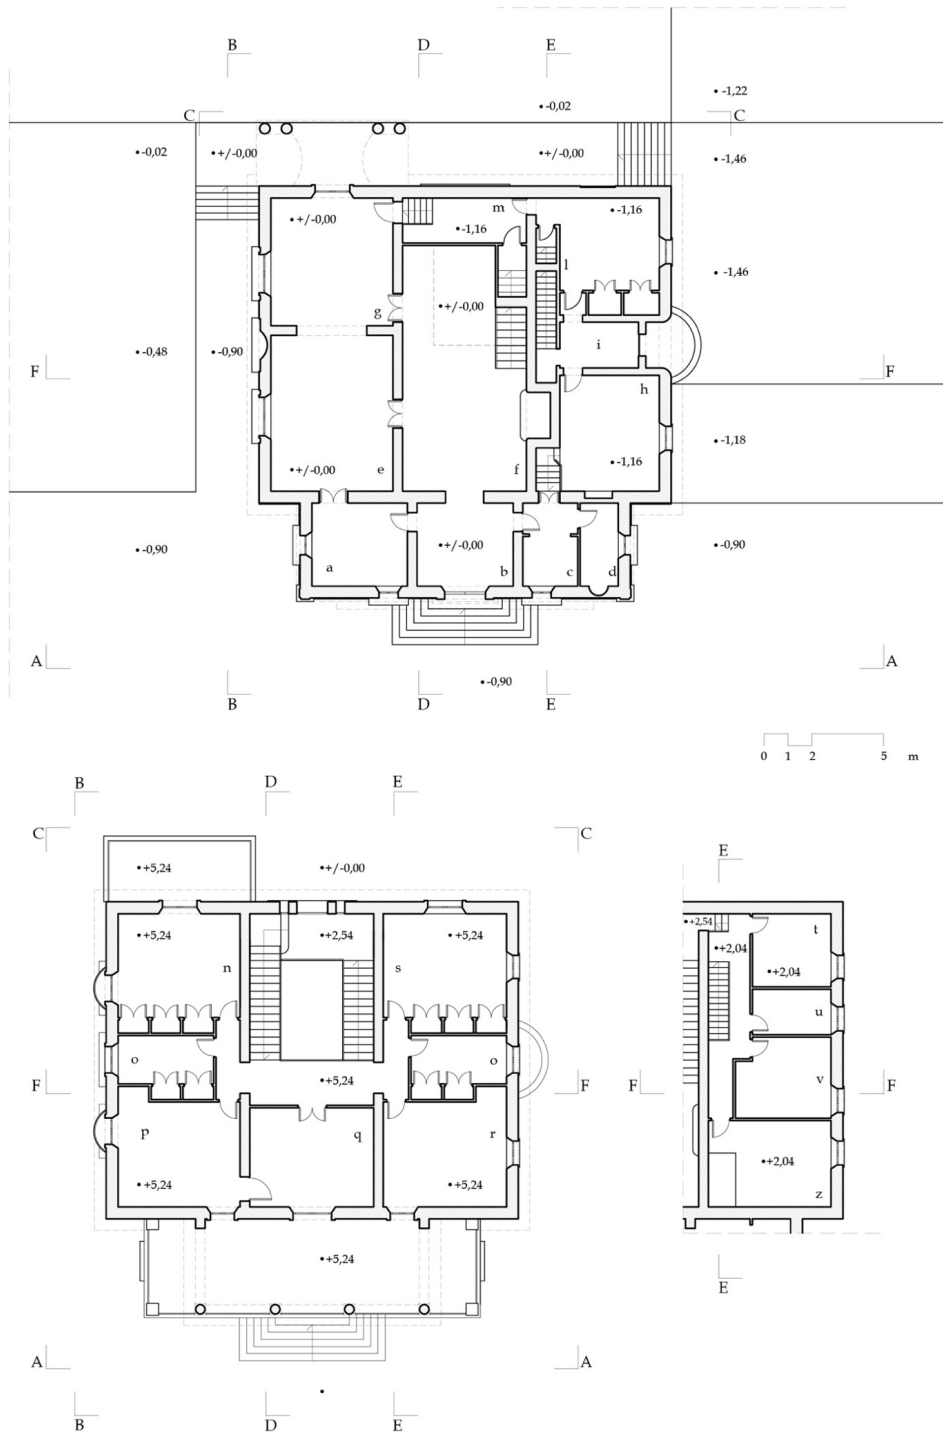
Casa Giobbe della Bitta (by Marcello Piacentini). Top center: ground floor (section plan at +1,20 m); bottom left: first floor (section plan at +6,44 m); bottom right: middle floor, servant dwelling (section plan at +3,24 m); a) lawyer's office; b) entrance; c) cloakroom; d) bathroom; e) living room; f) hall; g) dining room; h) pantry room; i) secondary room; l) kitchen; m) office; n) master bedroom; o) bathroom; p) bedroom; q) private office; r) cloakroom; s) guest room; t, v, z) servant bedrooms; u) bathroom.
